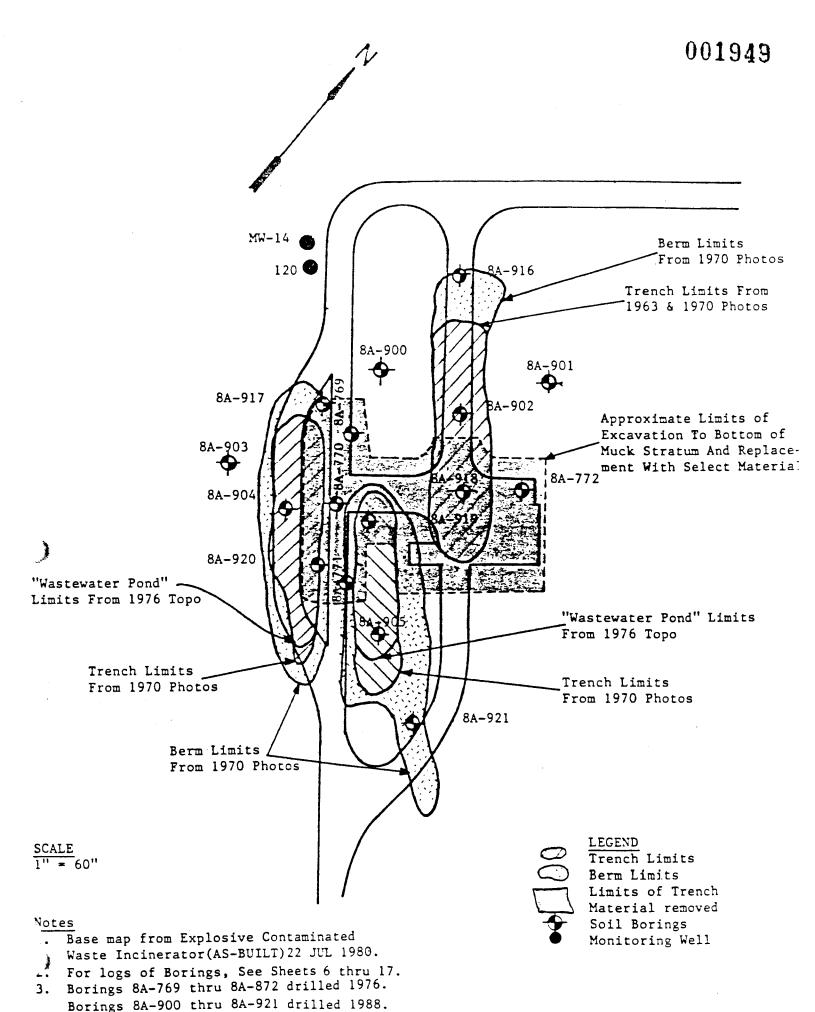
Trench Detail Beneath Air Curtain Destructor.
